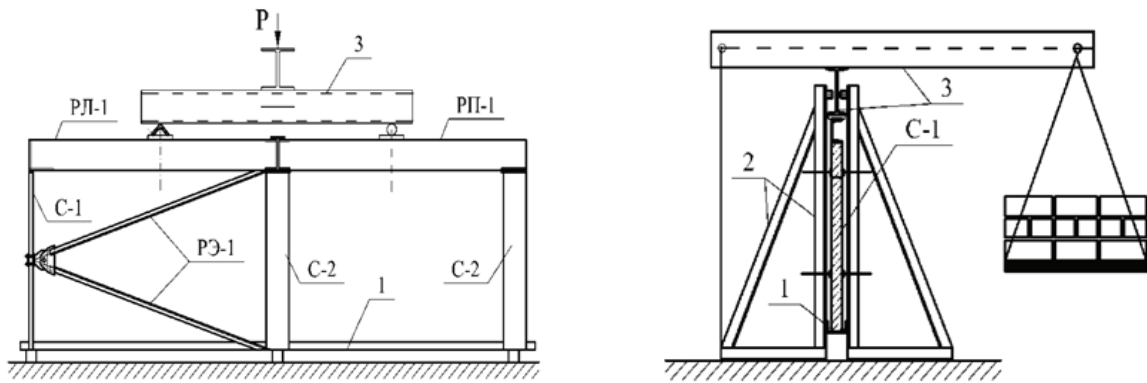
Flat frame of solid or composite section, without or with prestressing in a case of sudden disconnection of the torque connection of the left rack with the crossbar: 1 – support beam, 2 – struts with guides, 3 – lever loading system.
